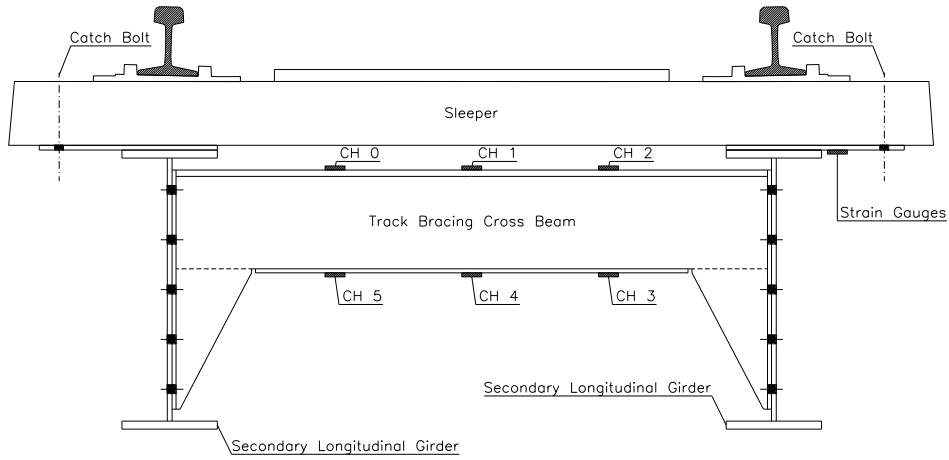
Strain gauge position on track bracing cross beam and sleeper supporting plates.
